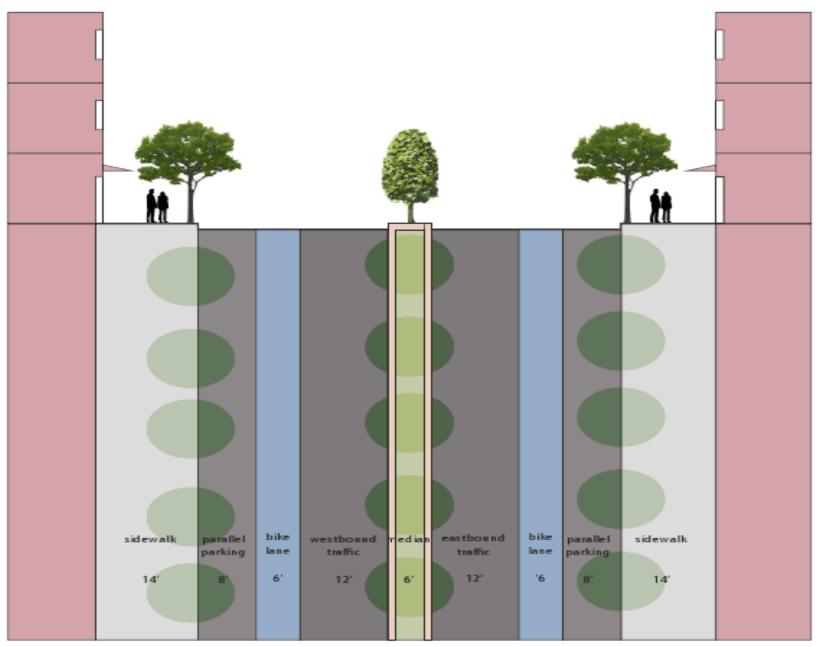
Streetscape of Lower Cornwall Avenue
